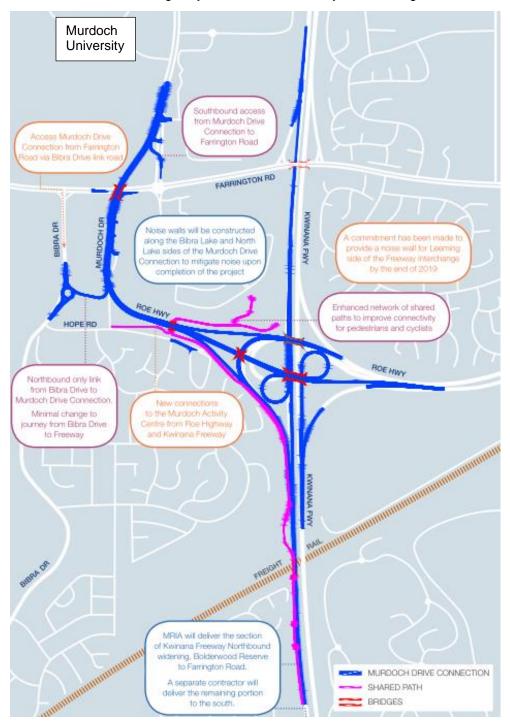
Murdoch Drive Connection Concept Plan (Source: Main Roads WA Website)
